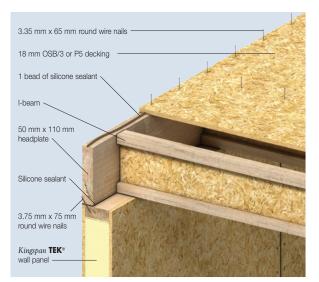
Installation of Floor Deck (Option 2 - Rimboard)
